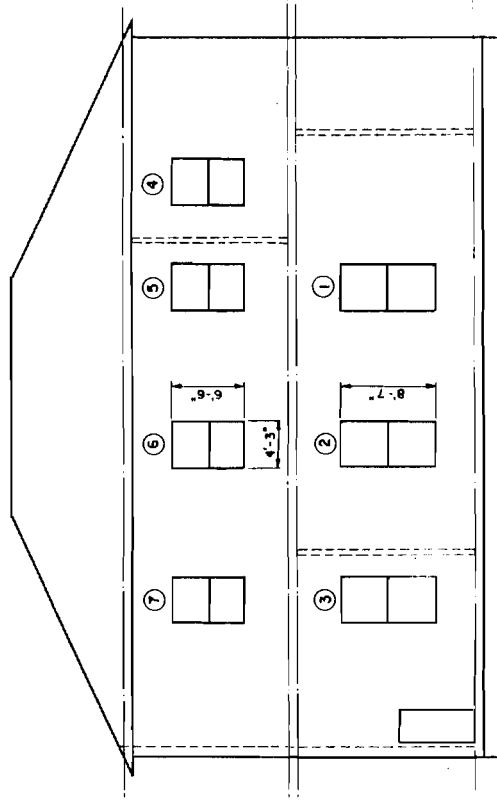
BUILDING No. 5 - TWO - STOREY WOOD FRAME DWELLING WITH CLAPBOARD EXTERIOR
